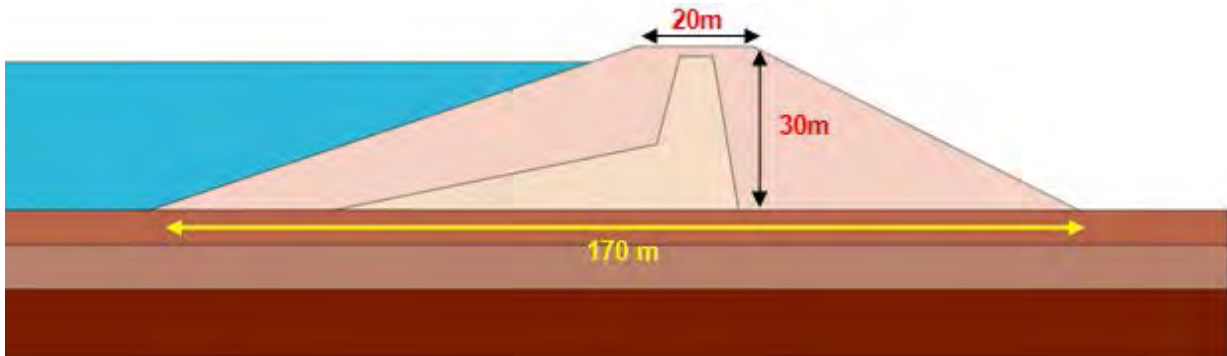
Cross Section View of the Carsington Earth Embankment Dam model, based on provided dimensions (On exact Scale).
